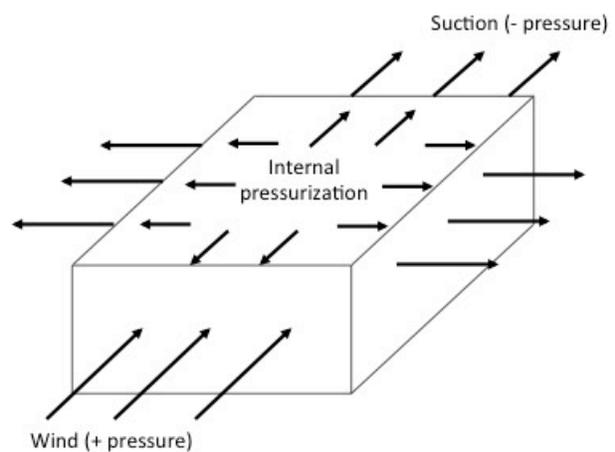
Exterior wall interactions with wind pressure. Adapted from the Whole Building Design Guide (Smith 2010)
